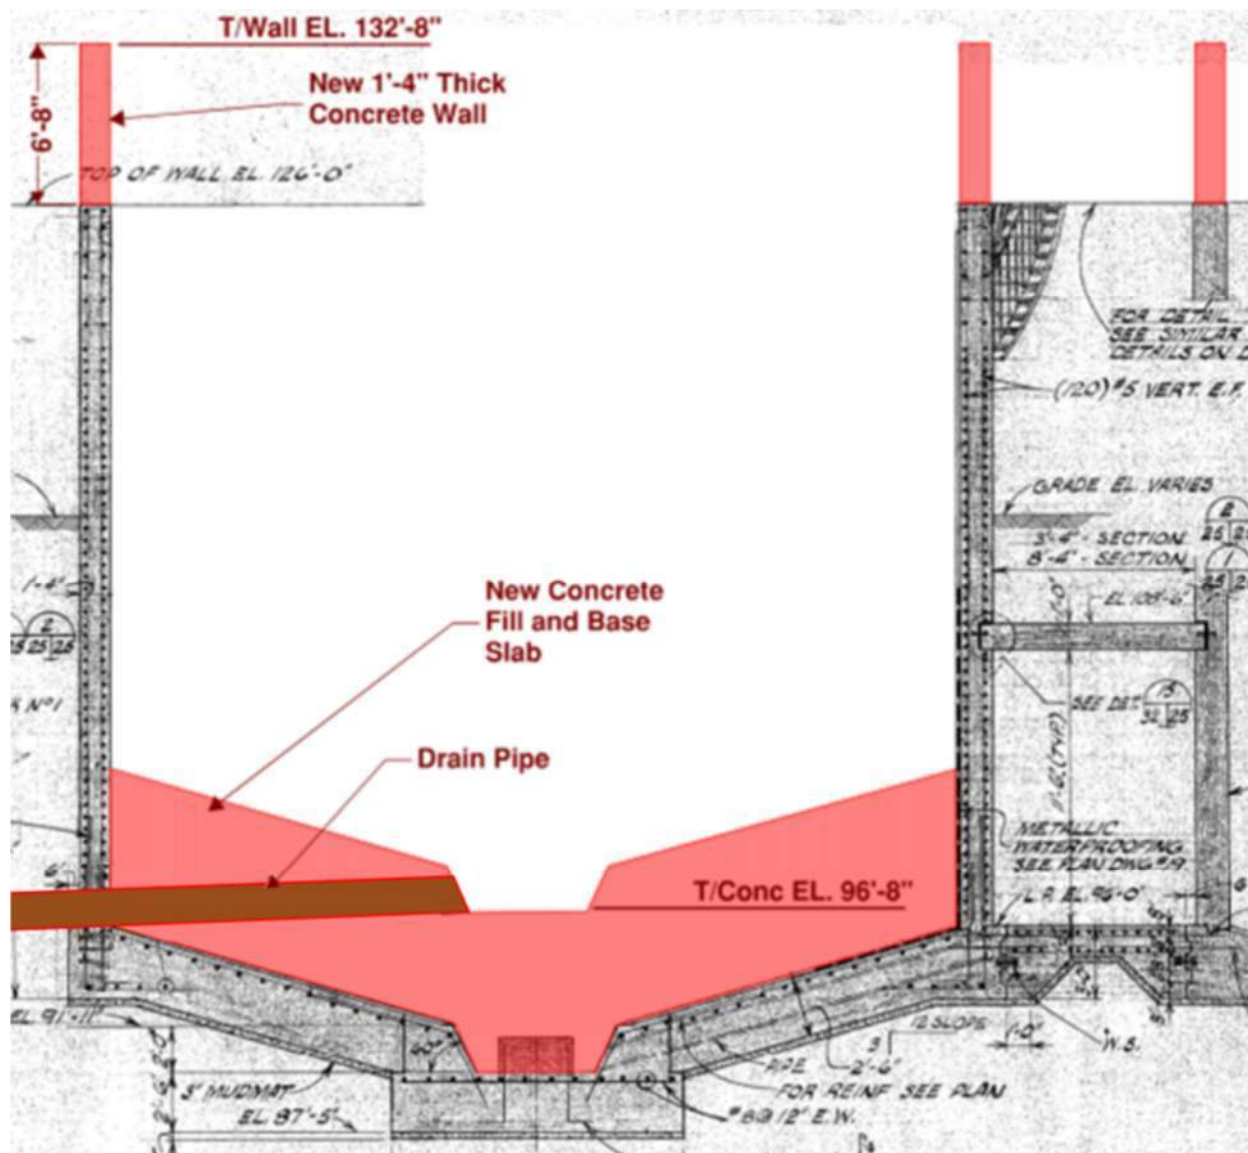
Alt-A2 - Raising SSTs 1-4 Concrete Tank Floors and Walls
